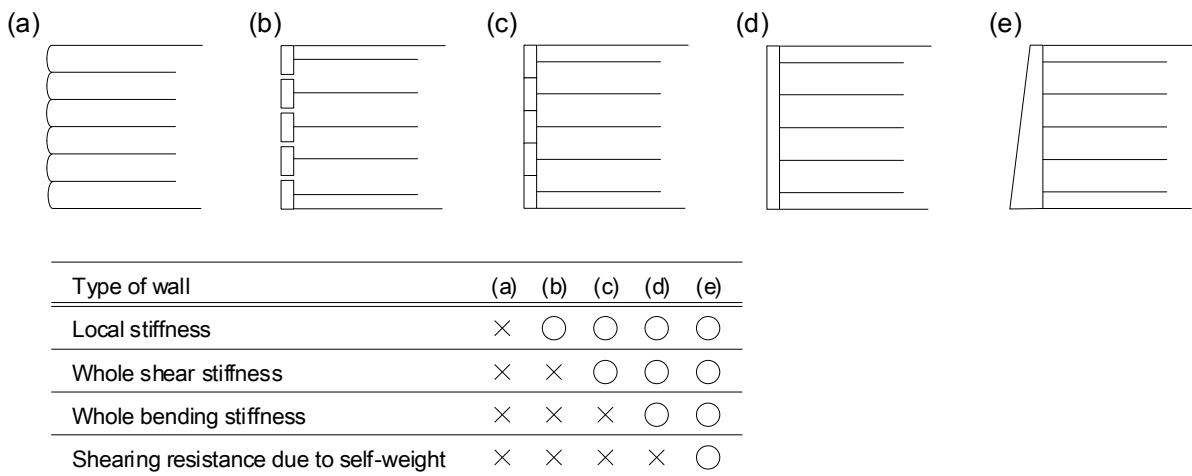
Classification due to mechanical role of wall structure: (a) soft wall structure, (b) rigid wall without mechanical interaction between wall panels, (c) rigid wall simply constructed by accumulating wall panels, (d) rigid wall, and (e) retaining wall (Tatsuoka, 1991).
